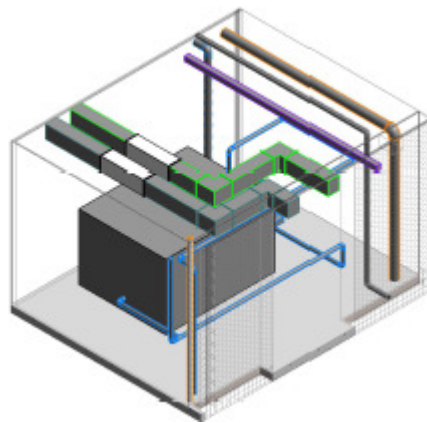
3D Ground Floor Plantroom – Turing House School
